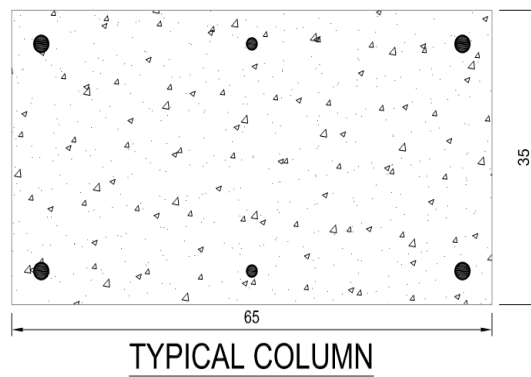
Typical column cross-section dimensions in centimeters [16]
